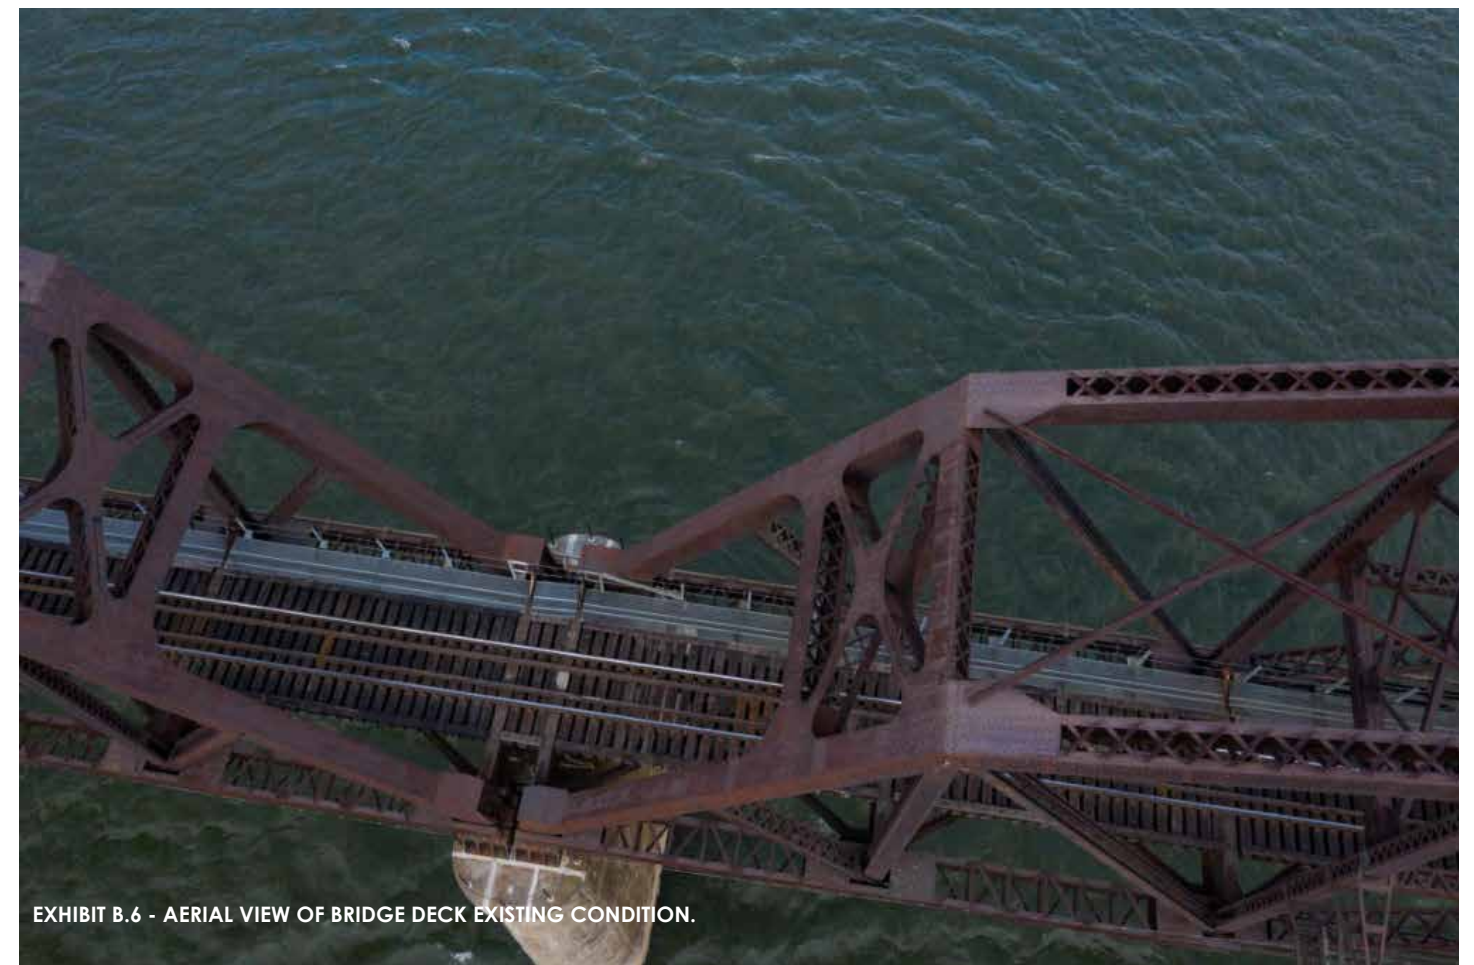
AERIAL VIEW OF BRIDGE DECK EXISTING CONDITION.
